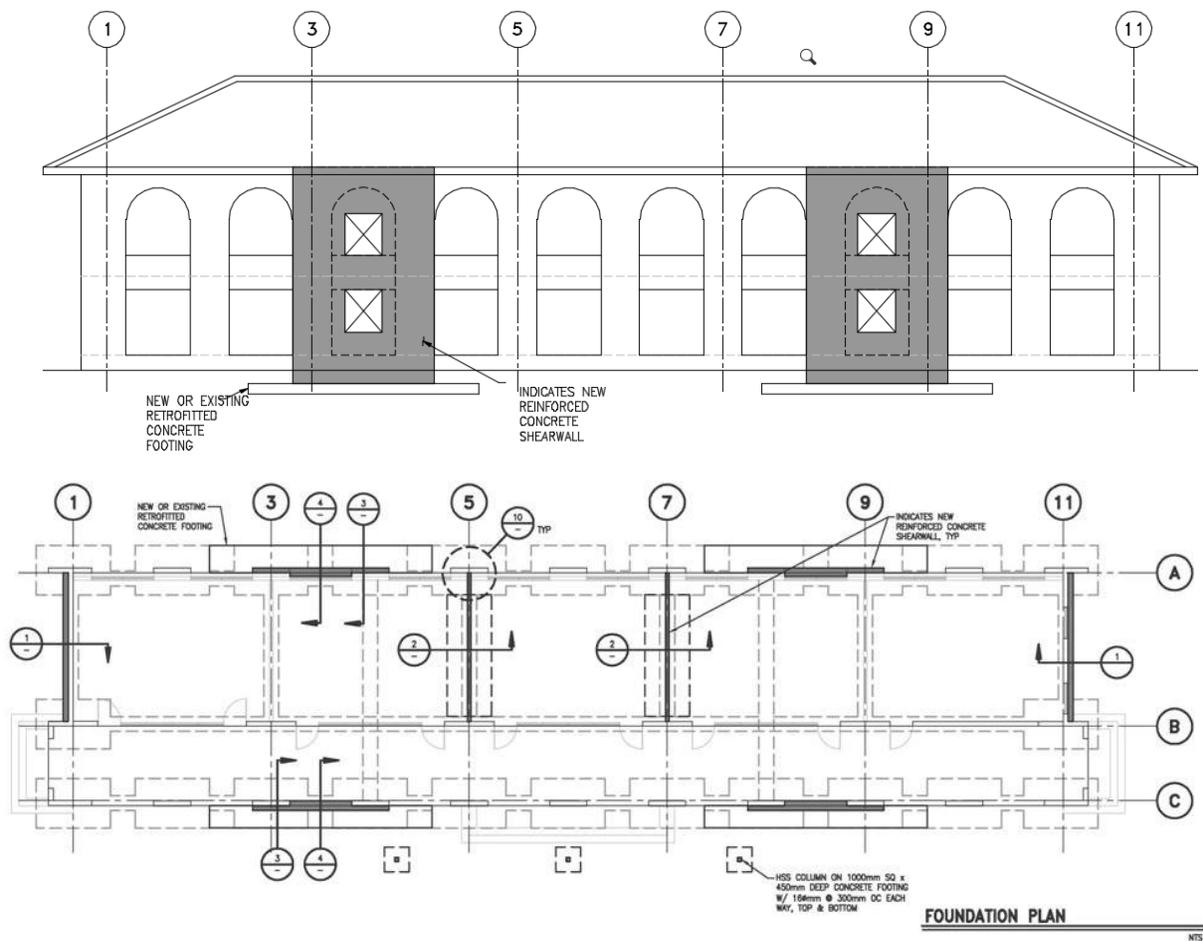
Schematic plans and elevations of added concrete shear walls for seismic retrofitting
